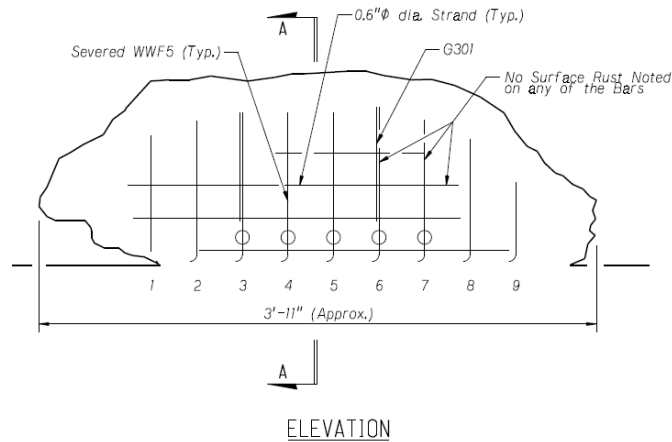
Severed strands and transverse reinforcement, from the repair documents of Scottsbluff Gering Bypass Bridge, courtesy of NDOT
